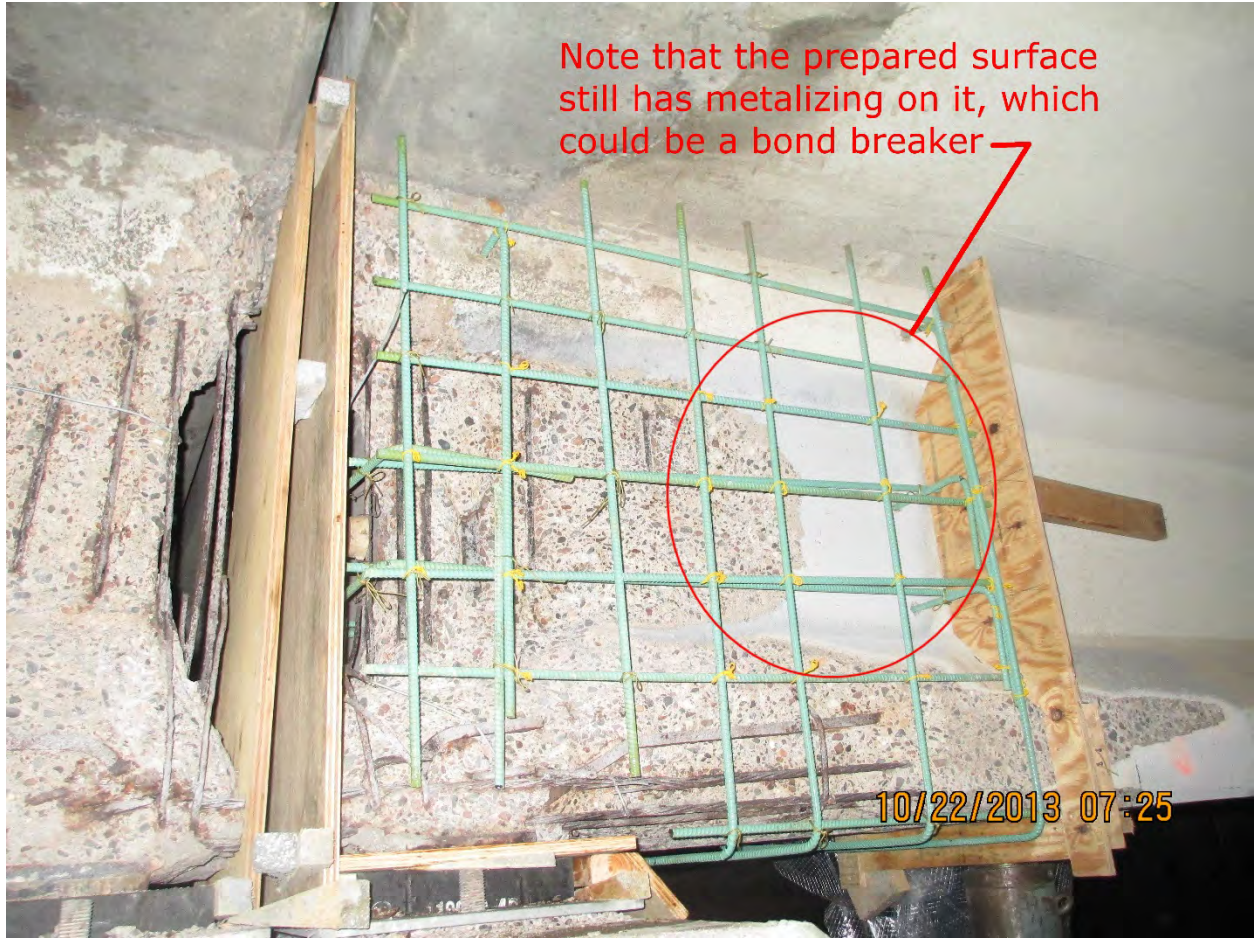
Prepared Pier 26 beam end just prior to shotcreting.
